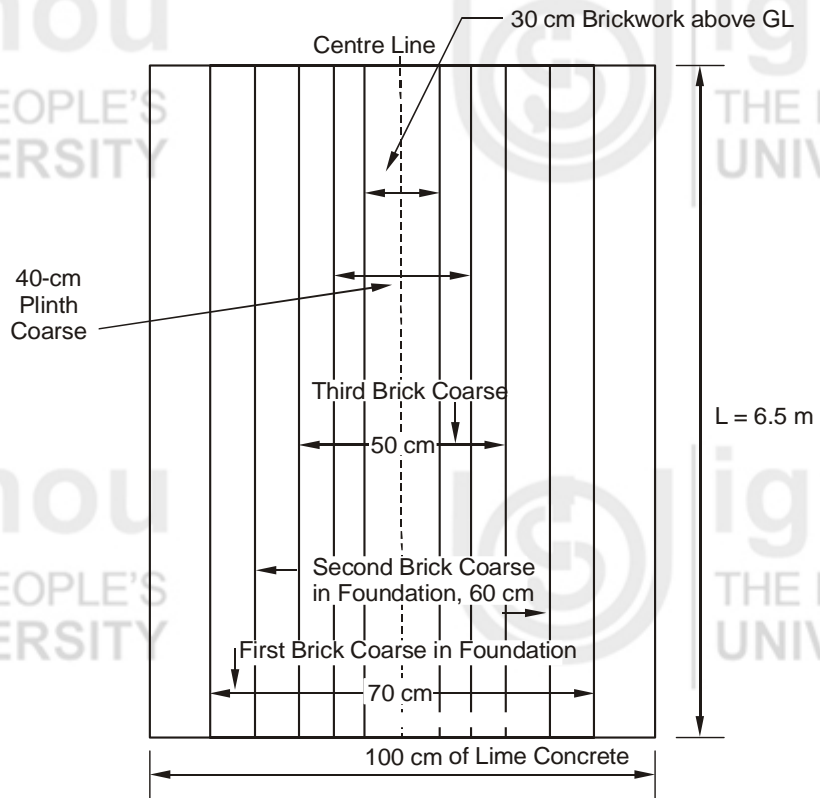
Plan of the Foundation Trench for a Straight Compound Wall (Figure 1.20)
